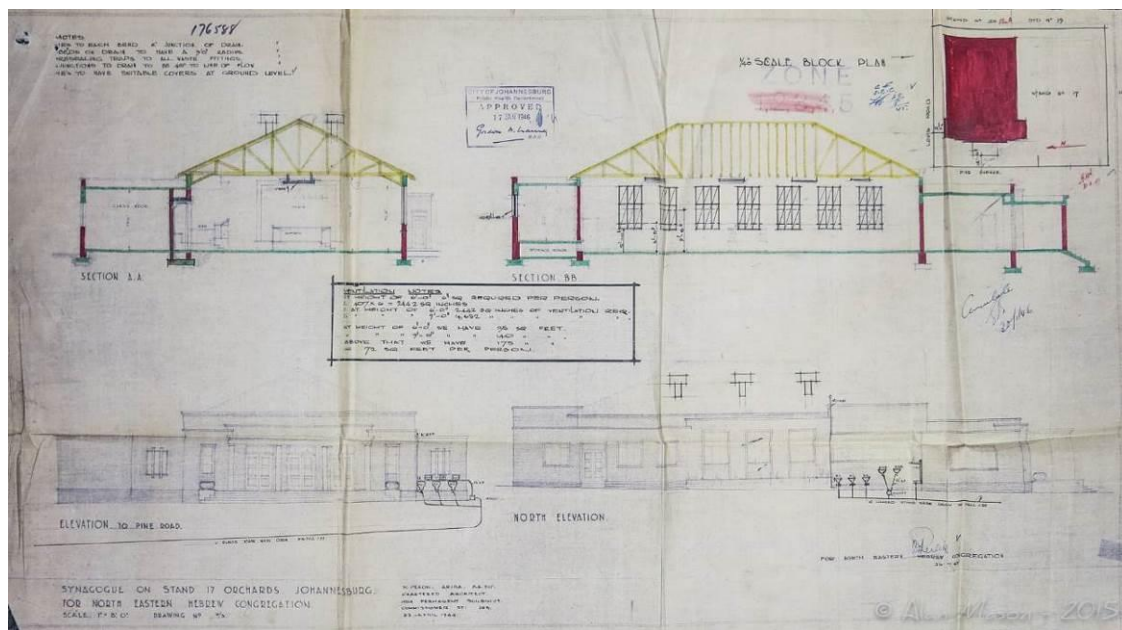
Plan for proposed Synagogue on Stand 17 for North Eastern Hebrew Congregation Second single storey building on Stand 17 (Source: City Council of Johannesburg, Plans Archive)
